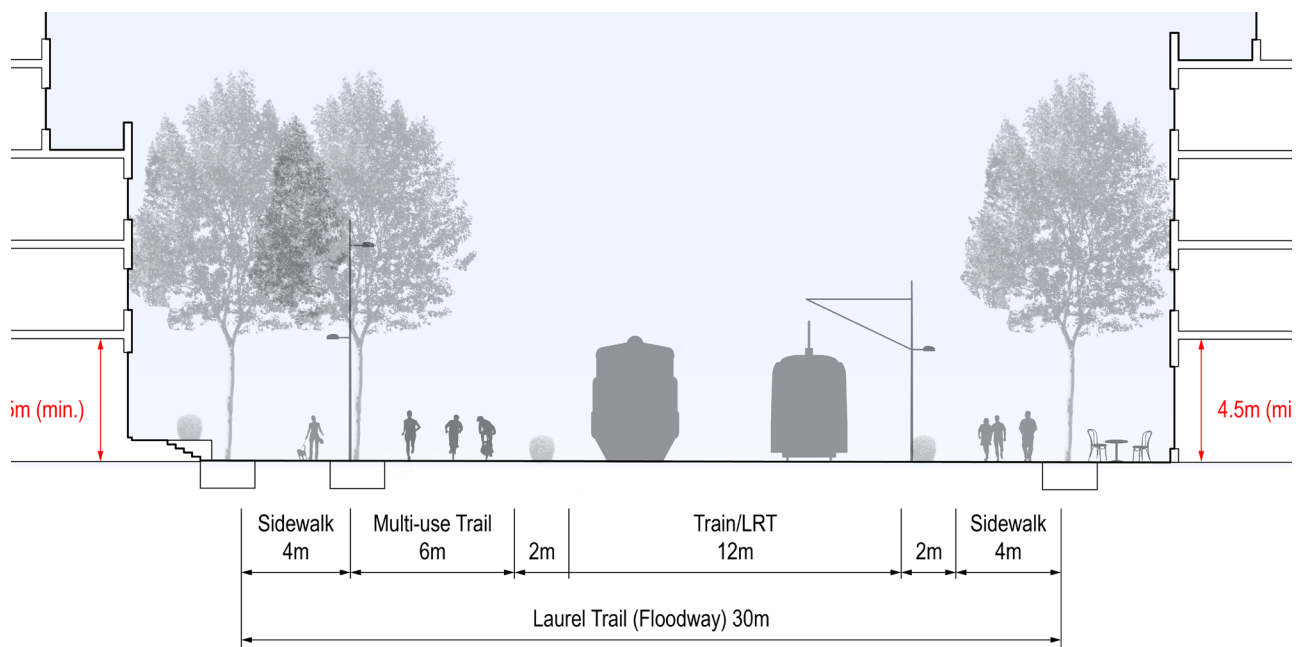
Proposed Cross-section of the Laurel Greenway Between King Street South and Caroline Street
